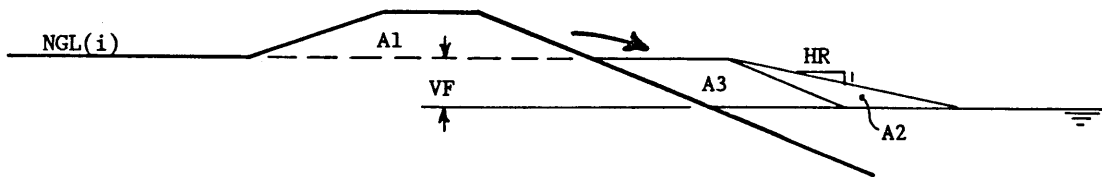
Case 2 Cross Section: Striking Dam Onto Clays
